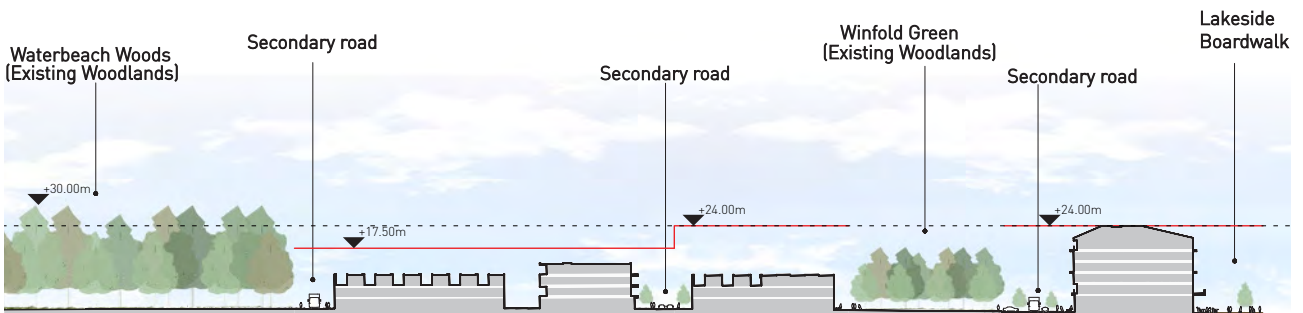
Extract from the OPA site-wide sections, illustrating building heights in relation to existing landscape features
